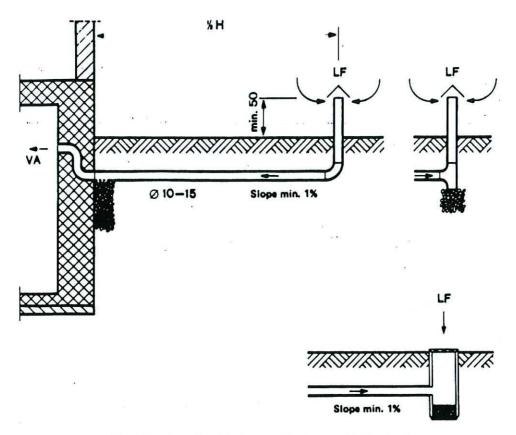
Air intake with pipes outside the area of falling debris.
